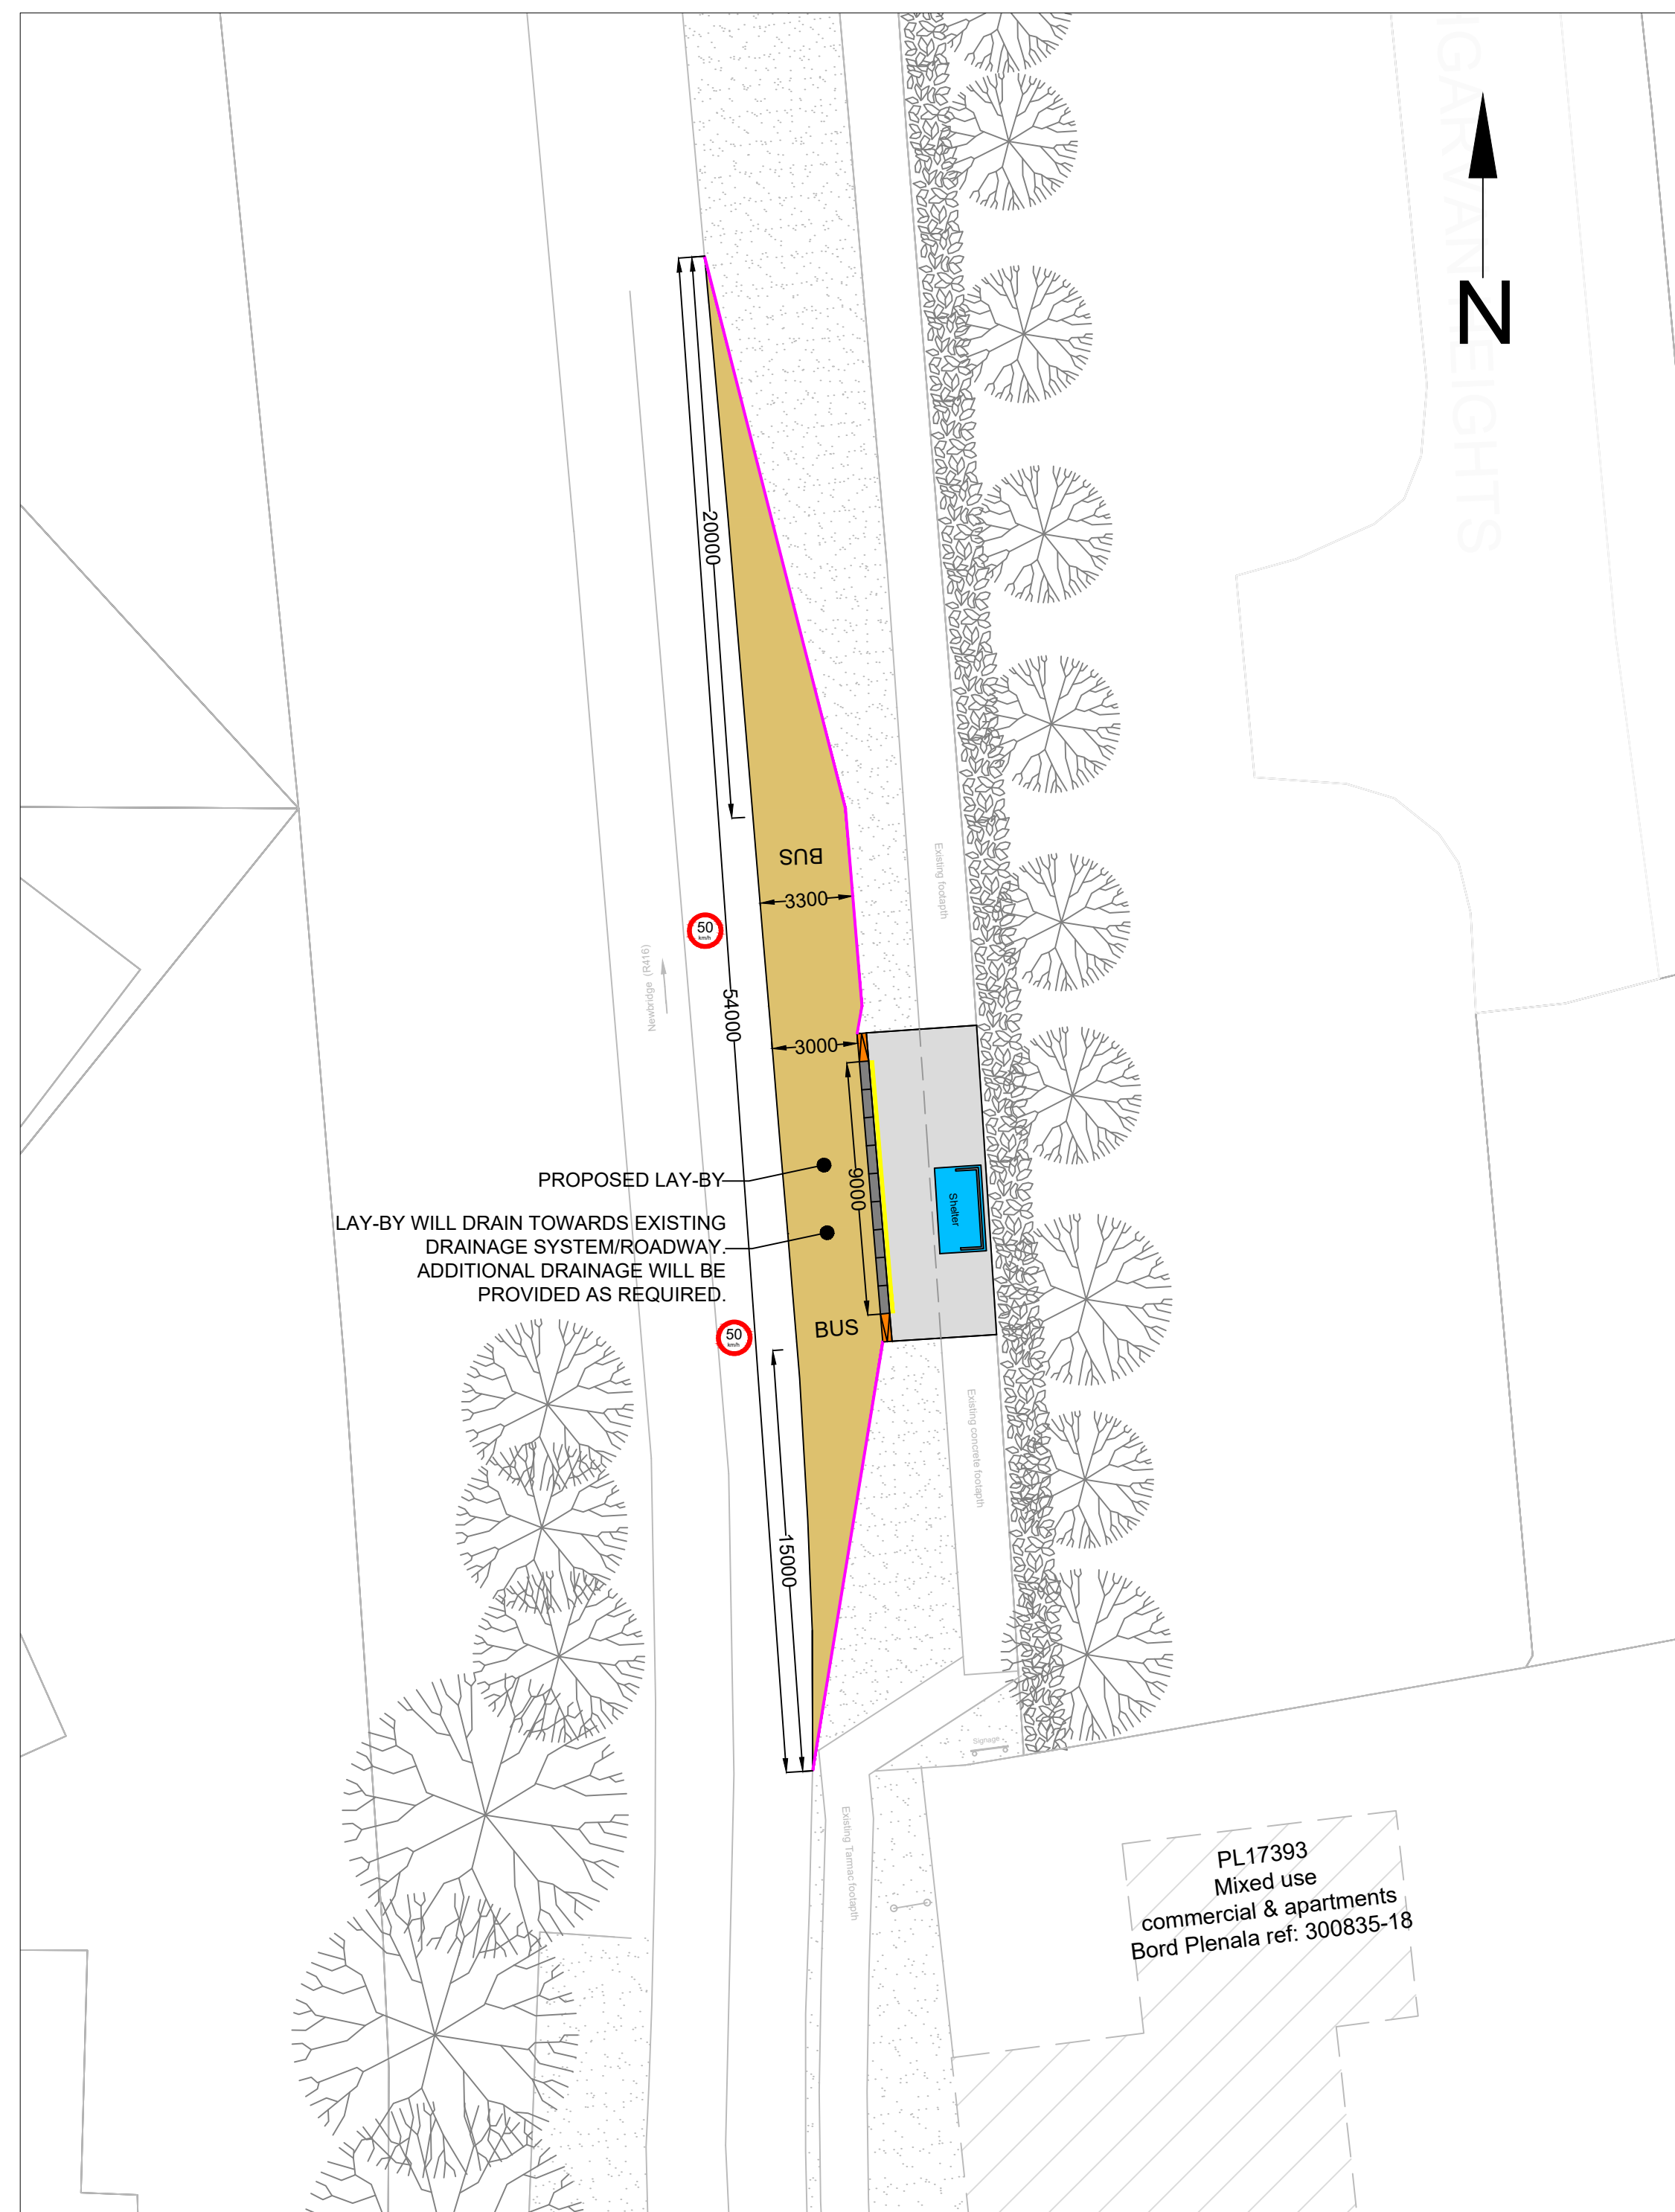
Layout Plan proposed new South Bound Bus Shelter/Boarding platform
